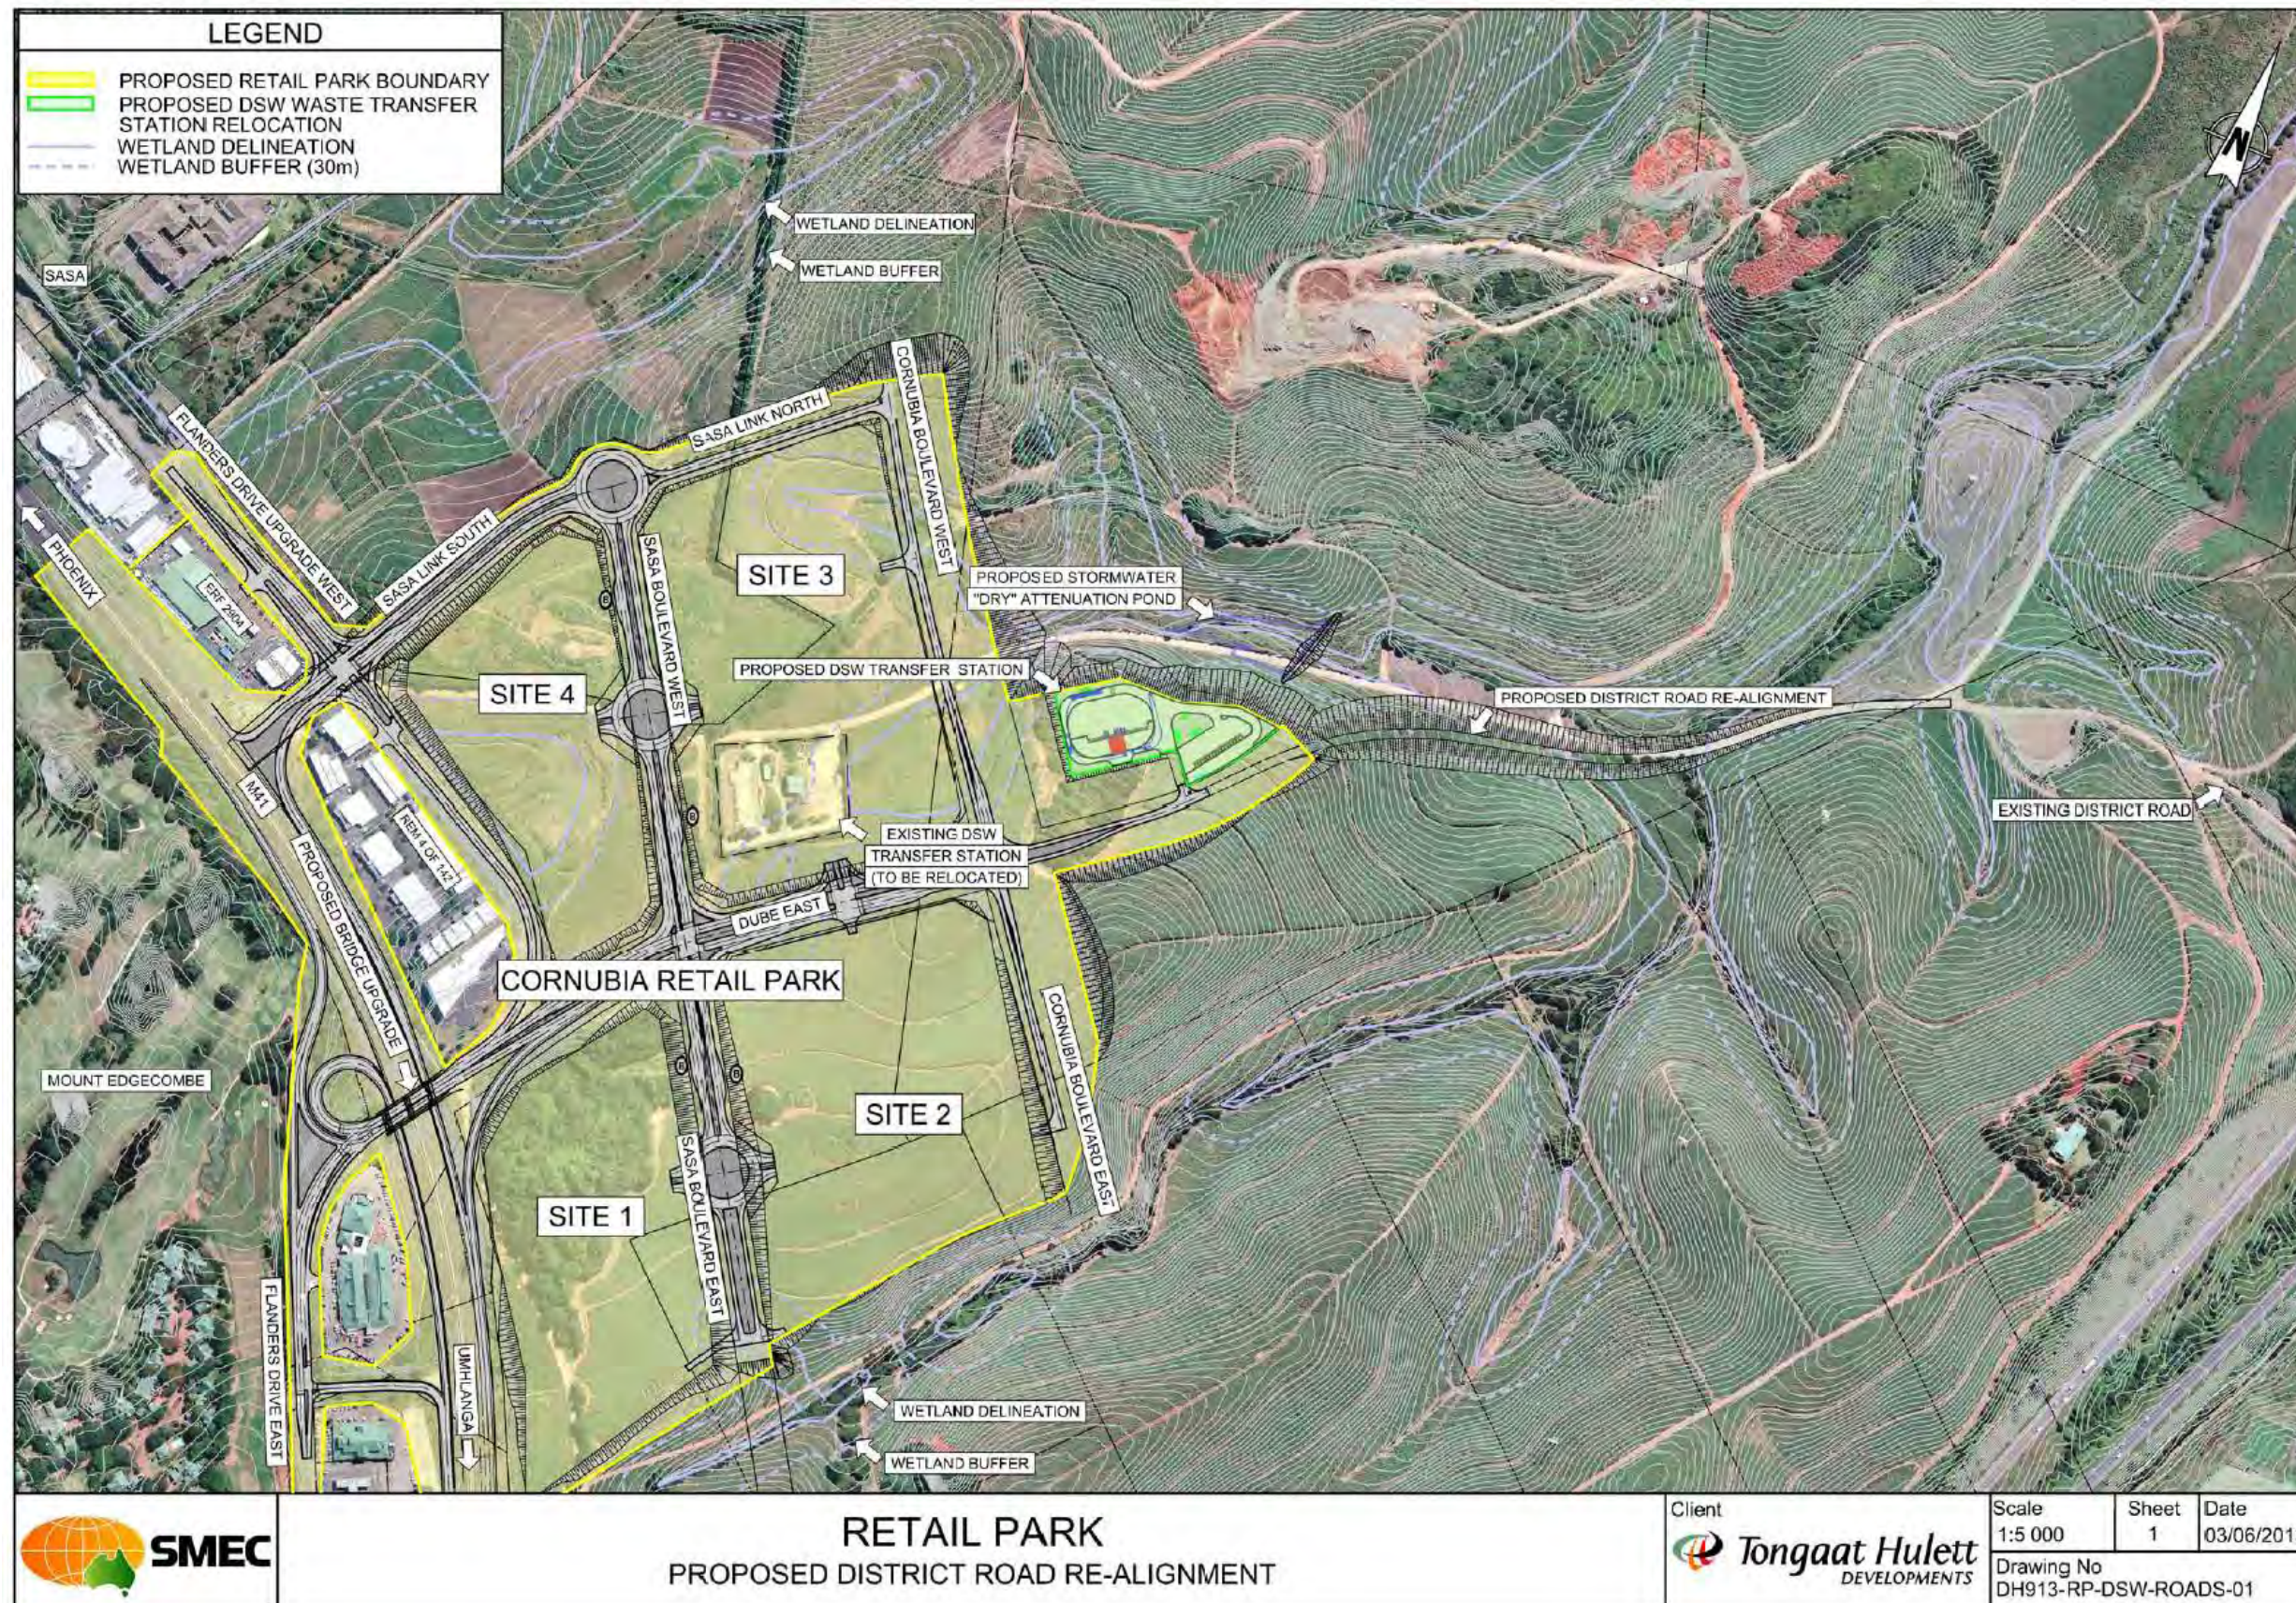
Alternative Site 1 and Access Road for the Proposed New Location of the Mount Edgecombe Refuse Transfer Station
